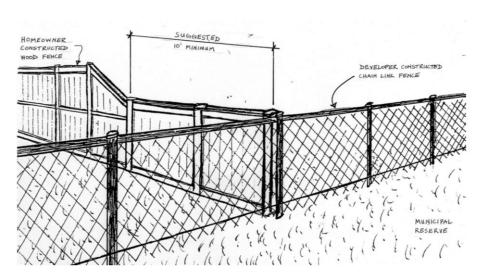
Fencing Plan – Schonsee Wetlands and lots backing onto walkway or open space.
